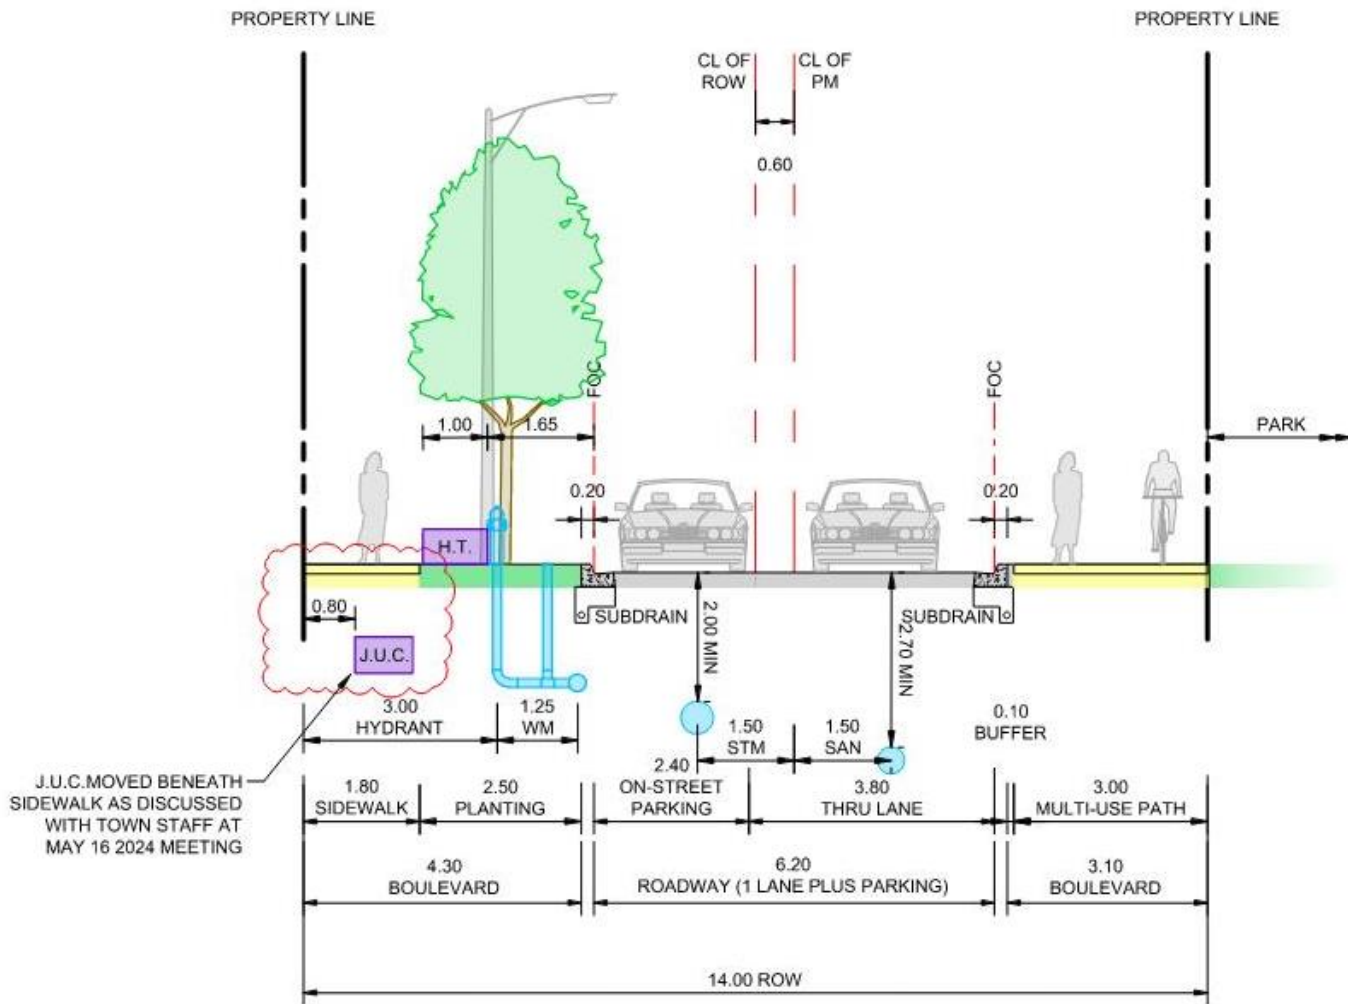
14 METRE CROSS-SECTION: ONE-WAY, ADJACENT TO CENTRAL PARK
